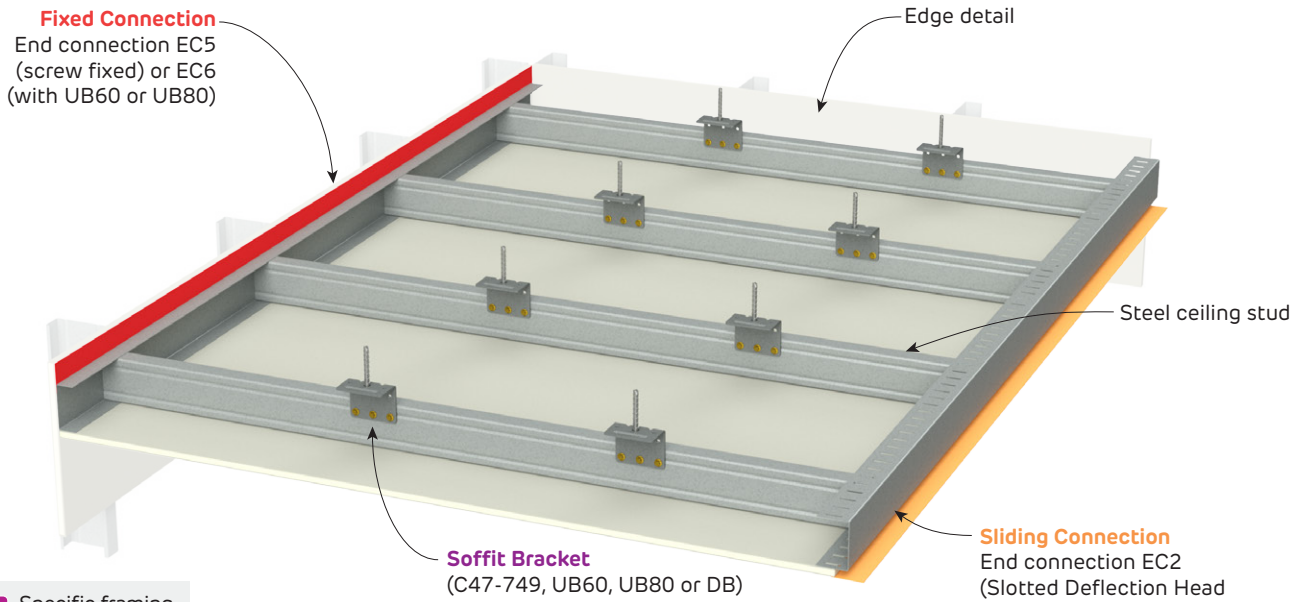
Stud Ceiling Type A3 - Fixed / Sliding
